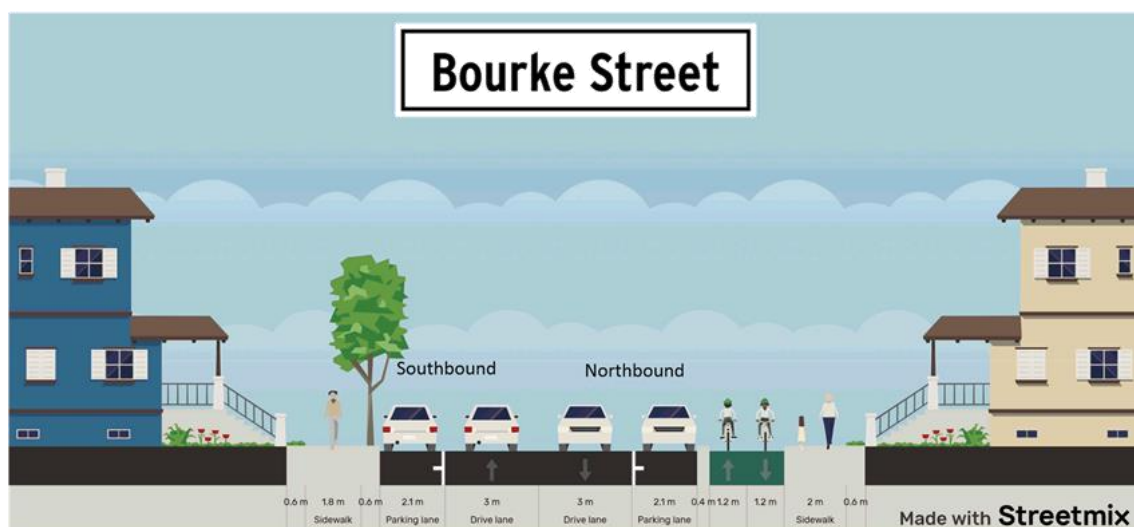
Cross Section of Proposed Bourke Street (40 Bourke Street)
